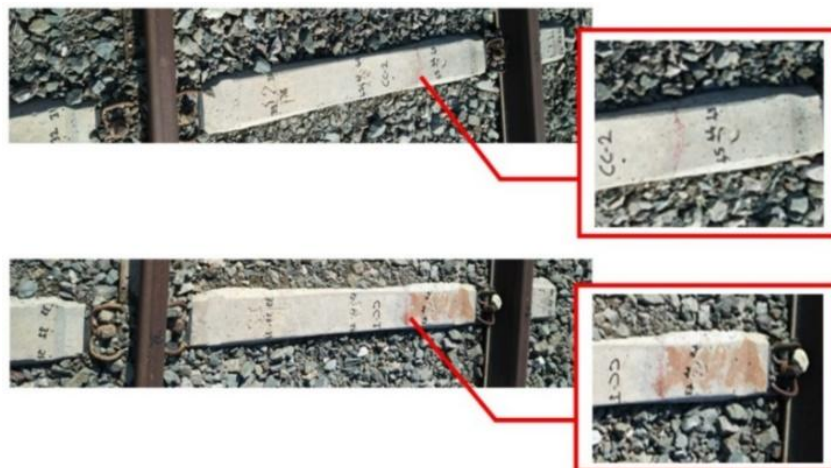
Central transverse cracks observed concrete railway sleeper samples (S-2) in the field
